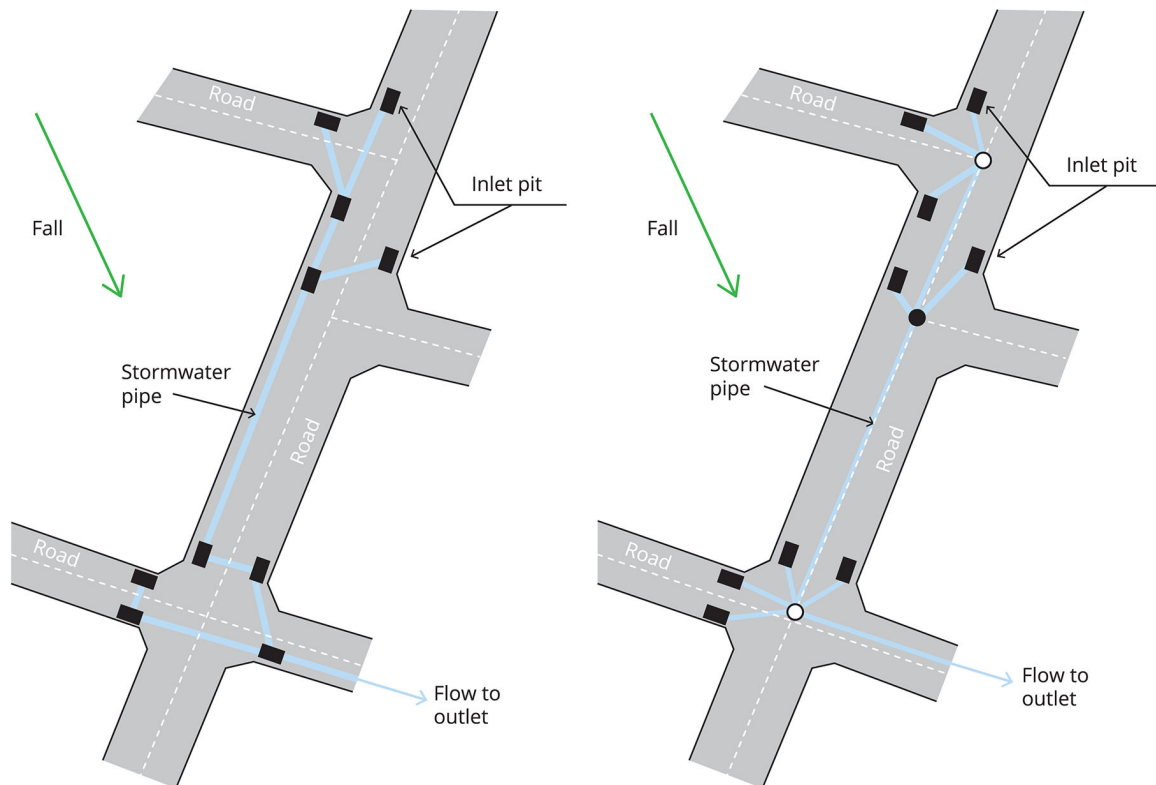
Examples of Configurations of Conveyance Networks in New South Wales (Left) and Queensland (Right)
